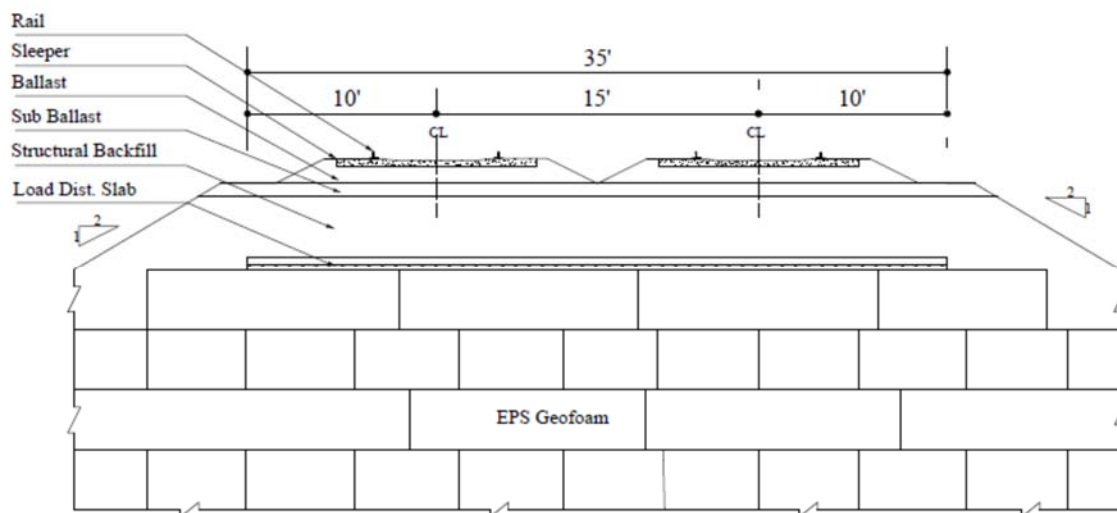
Cross-section of an EPS geofilm embankment at corner canyon of Draper city of Utah
